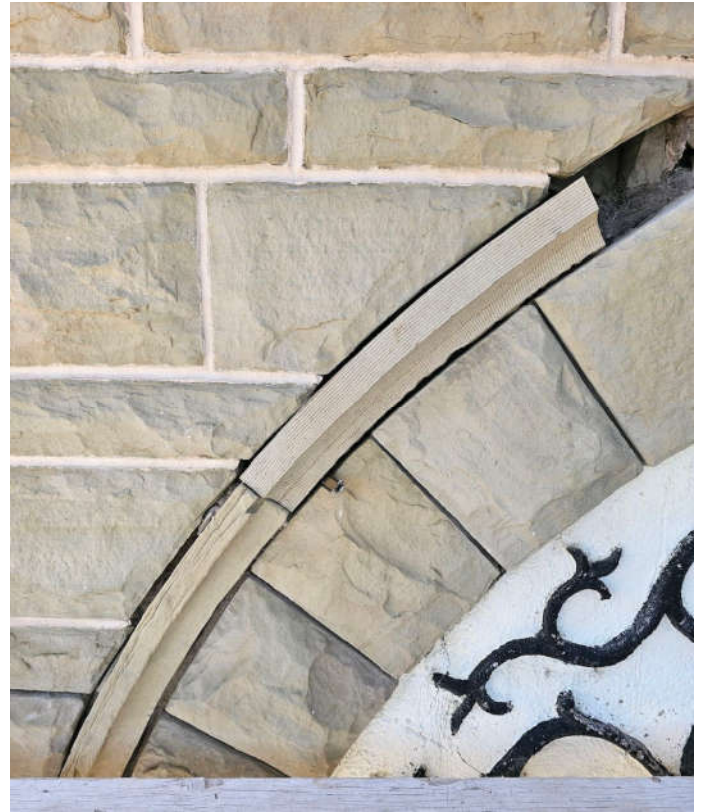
A replacement piece of radiused stone moulding above the plaster sign was fabricated by Mountain Masonry. (Photo Source: Mountain Masonry)
